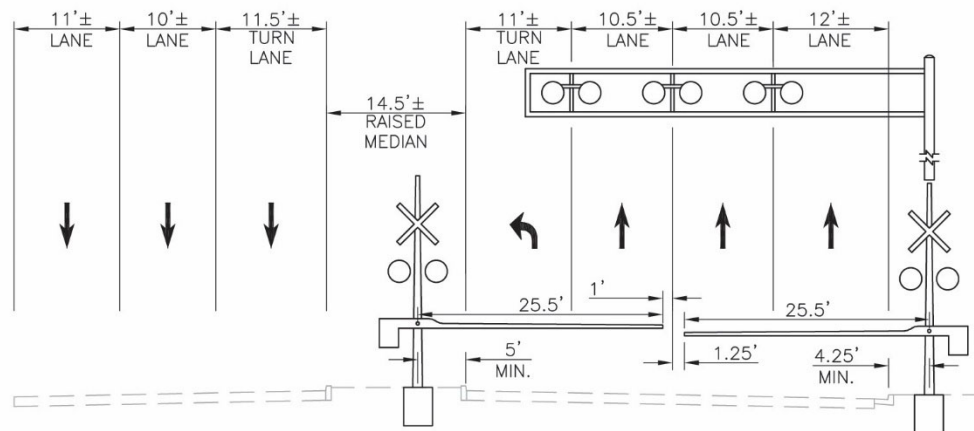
43<sup>rd</sup> Avenue Typical Section (NB)
